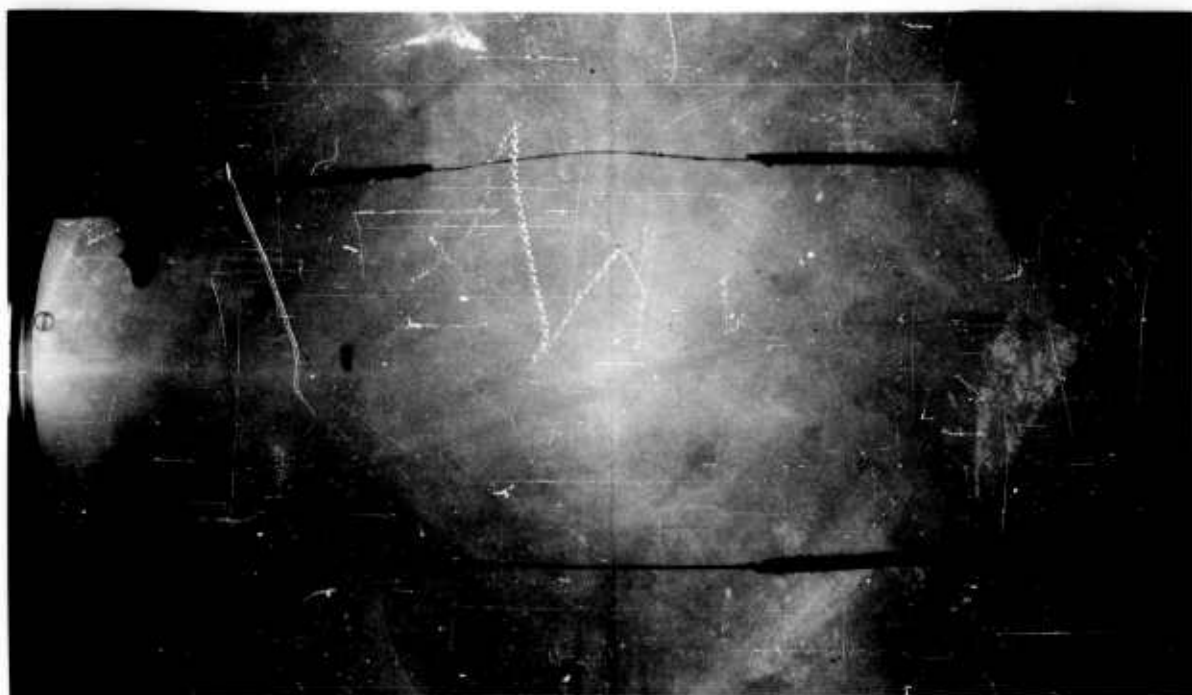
Actual wires used. Optical comparator photograph, upper wire is 1×10^{-4} inches diameter (wire 30), lower wire is 2.5×10^{-4} inches diameter (wire 31)
